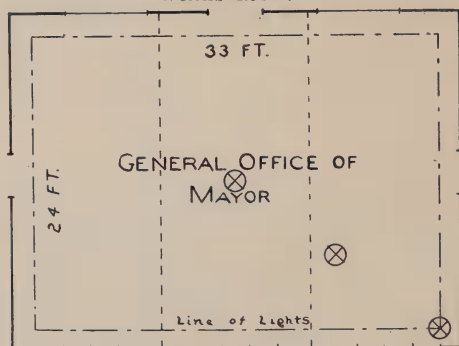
CEILING PLAN, MAYOR'S ROOM.
